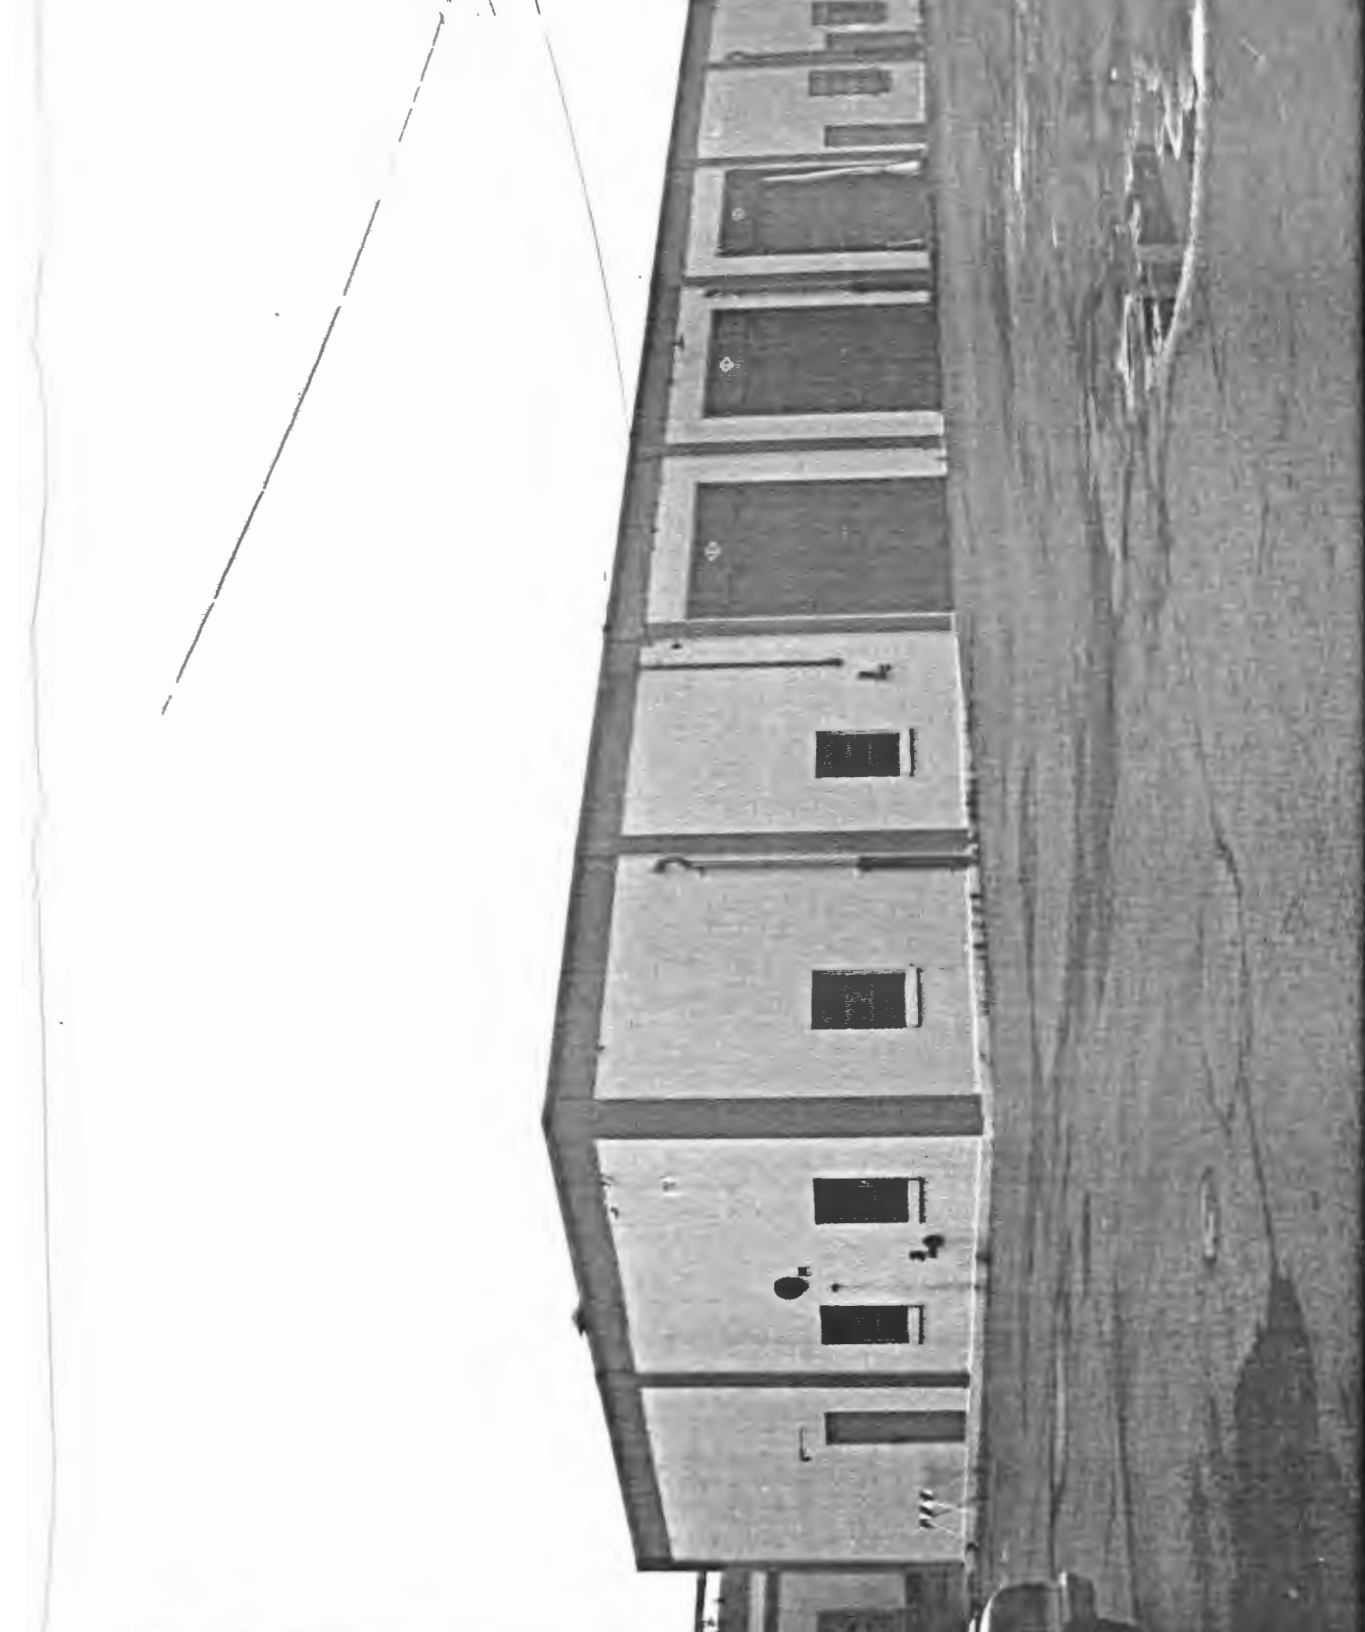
Building 722. This structure is typical of the buildings erected on the North Depot Activity during the mid-1950s. The buildings, which vary in size and function, have reinforced concrete frames and concrete block infill walls. (Source: Field inventory photograph, 1983, Barbara Hightower, Building Technology, Inc.)
